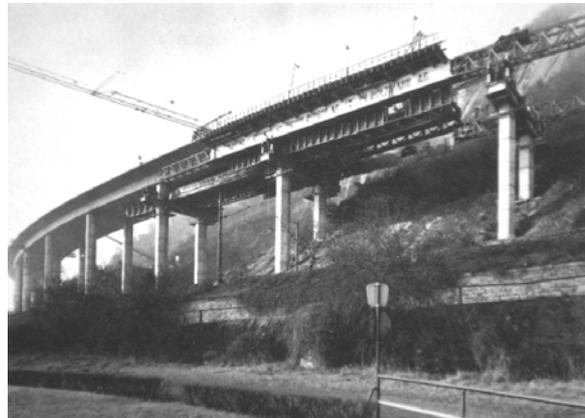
Krahenberg Bridge, first prestressed concrete bridge built using span-by-span cantilever construction method with self-supporting traveling formwork. (Wittfoht)
